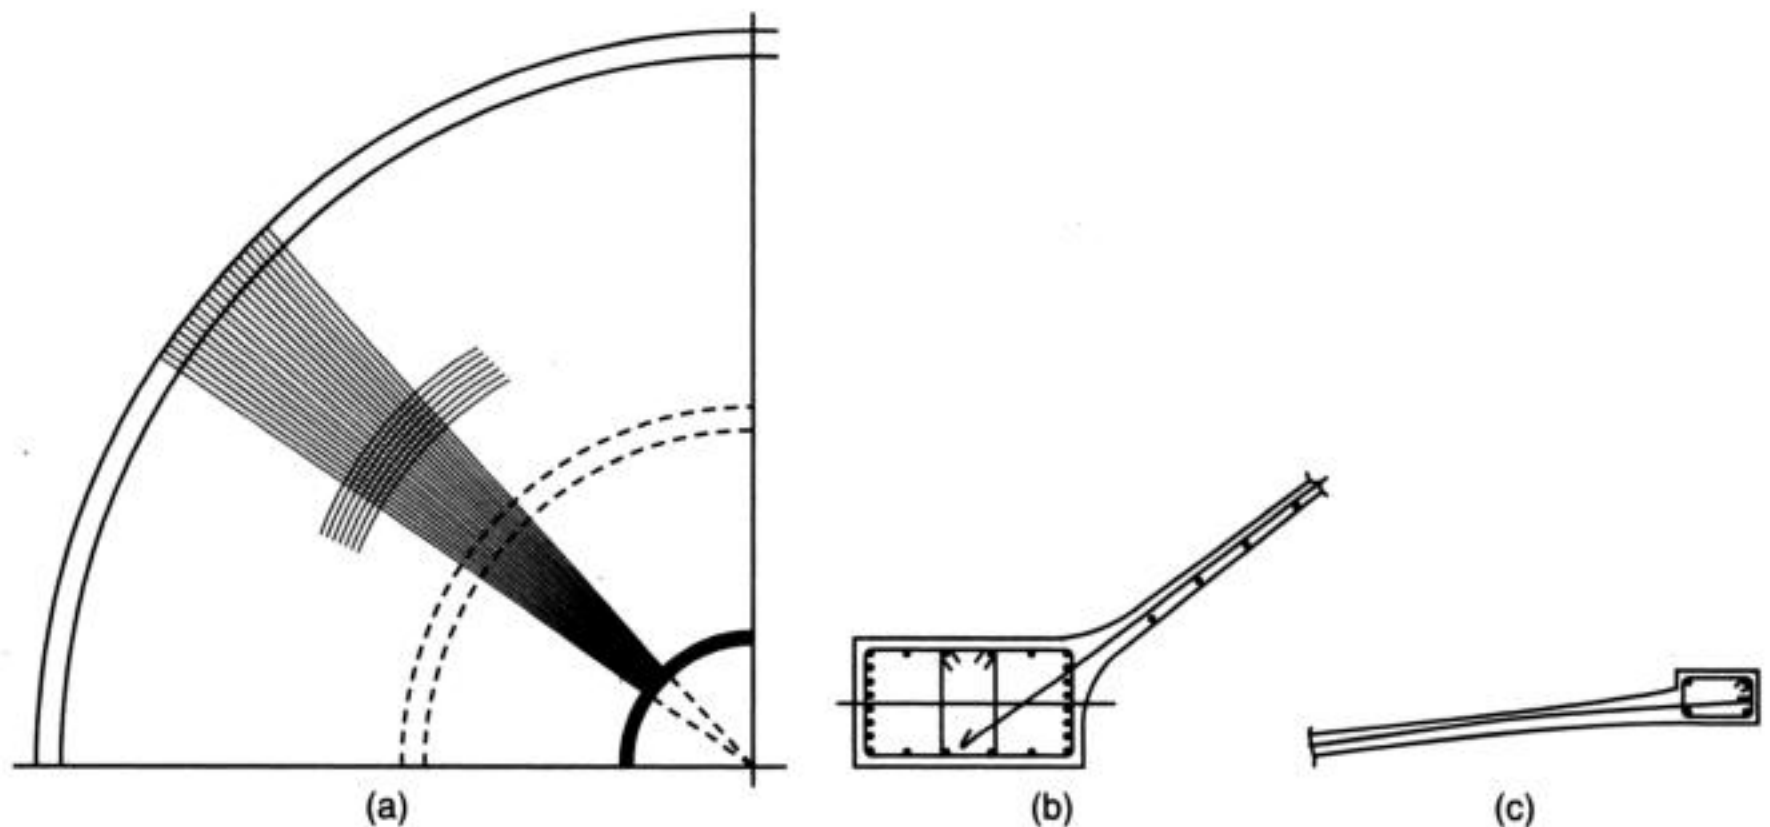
Detailing of steel in spherical dome with sky light: (a) Plan, (b) Bottom ring beam, and (c) Top ring beam.
